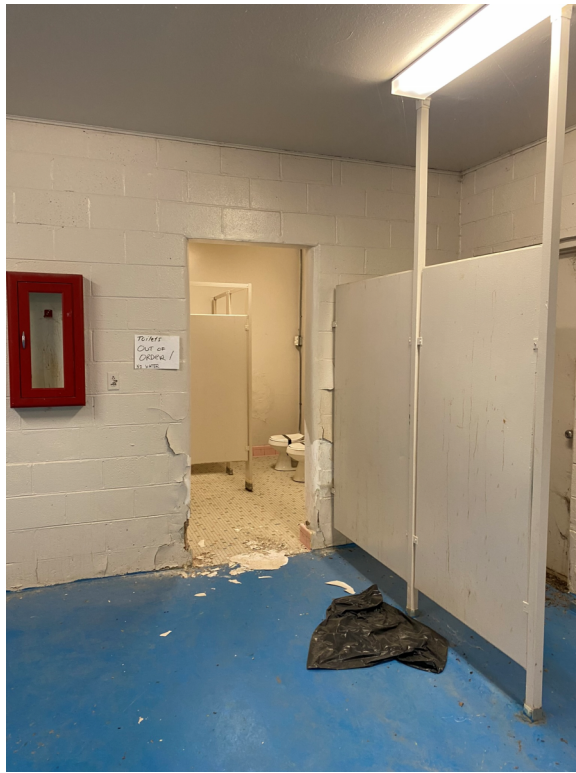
Gym locker room at bathroom opening with moisture damage.
